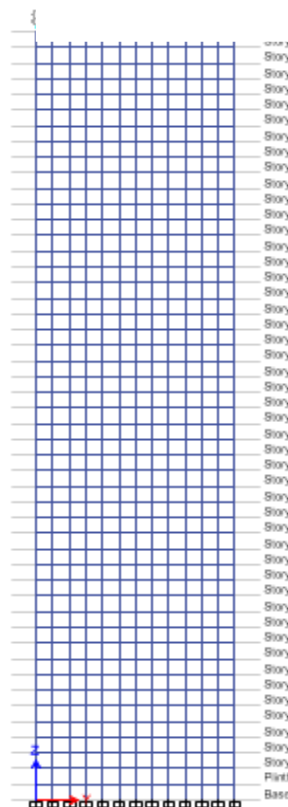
Elevation of Tube in Tube in Tube Structural
